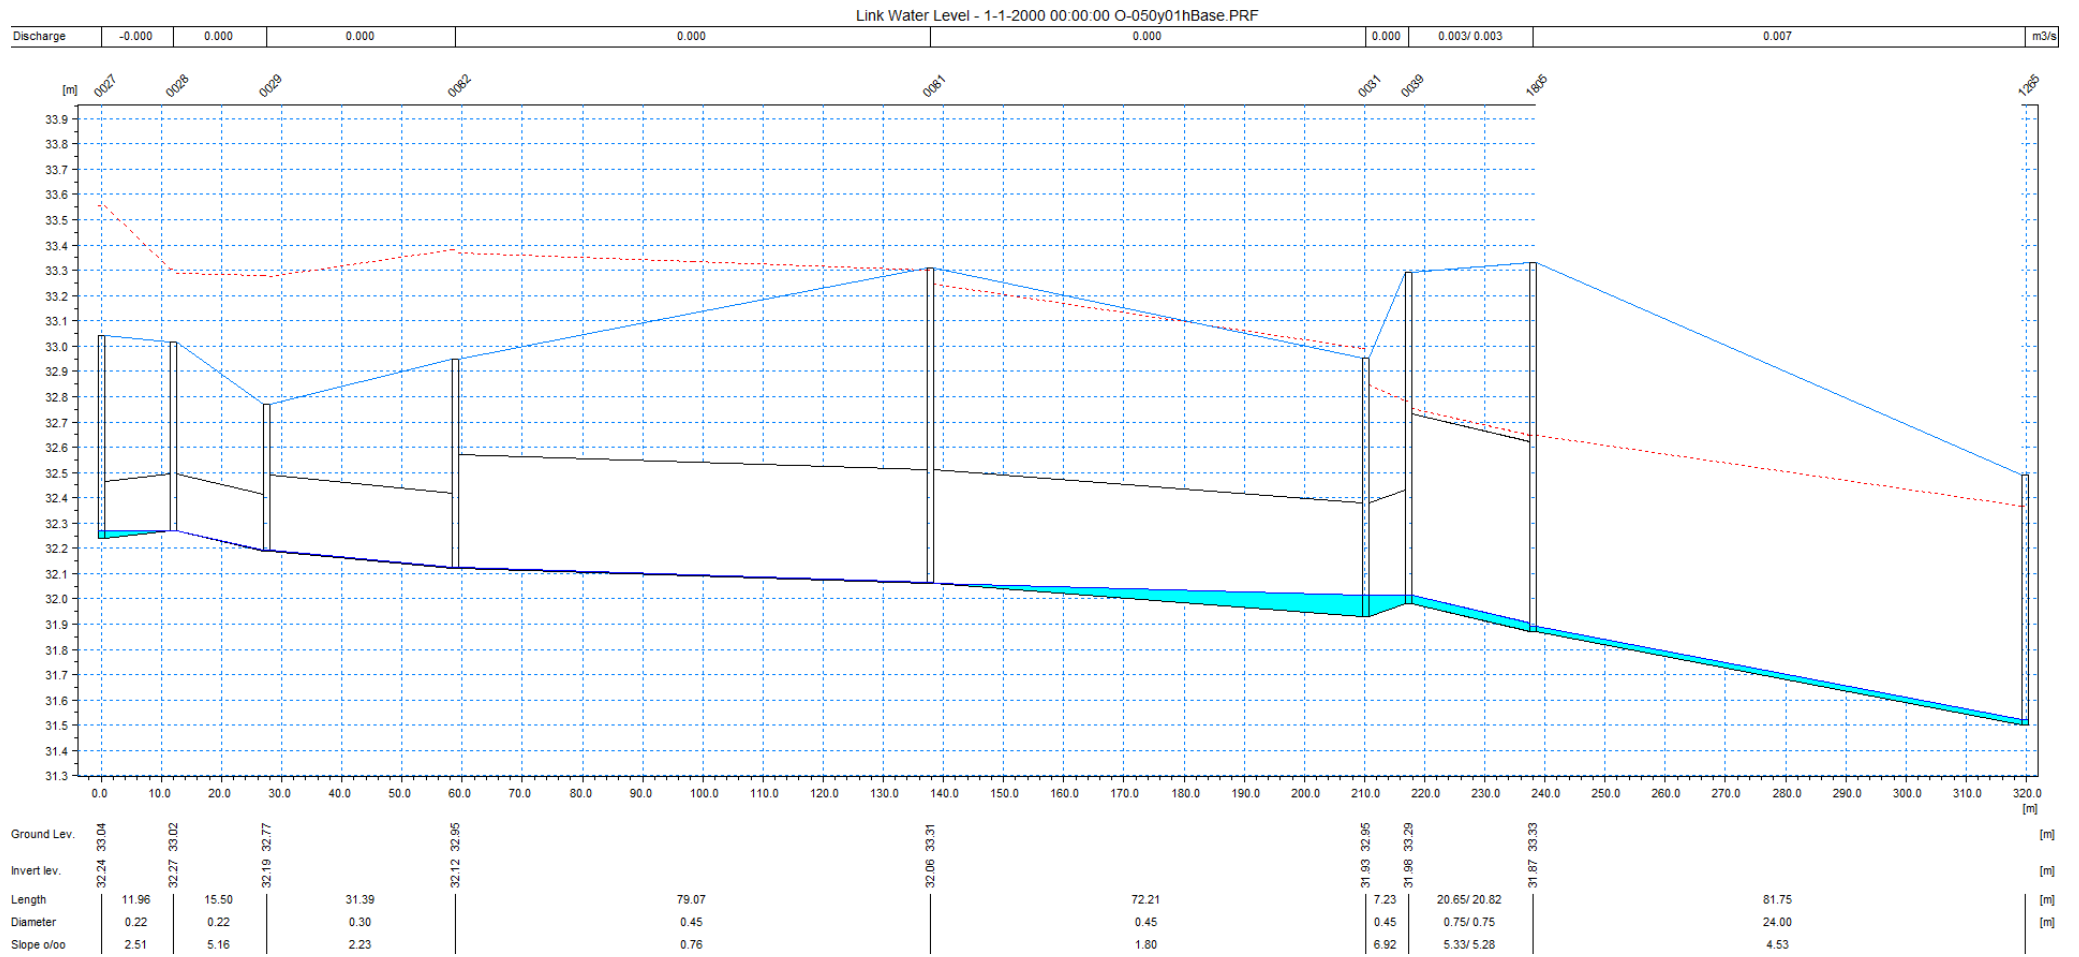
One hour 2% AEP storm long section without infrastructure upgrade
